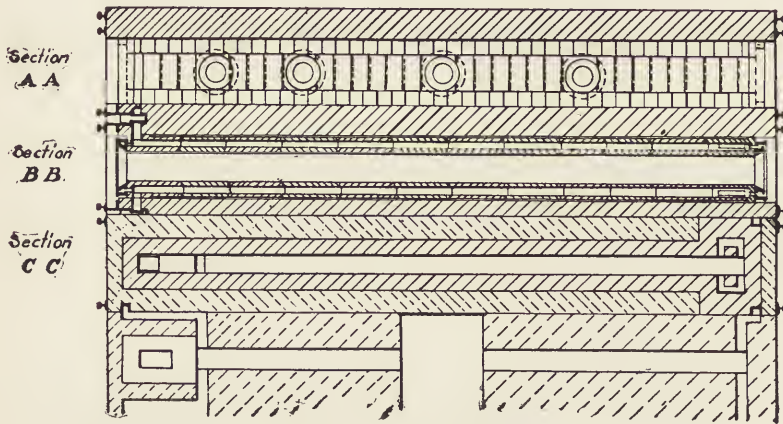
THE SEMET-SOLVAY COKE OVEN—SECTIONAL PLAN.
